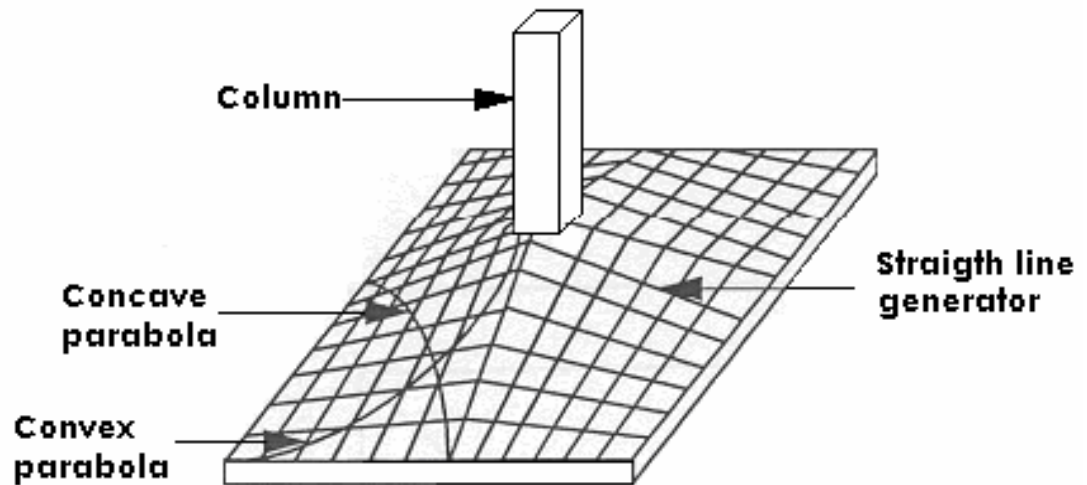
Hyperbolic paraboloid Shell foundation
